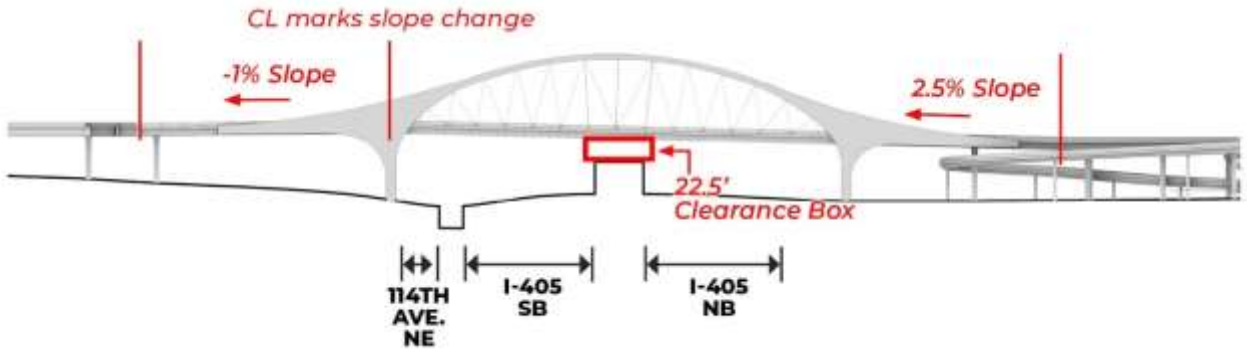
Elevation of the arch I-405 span alternative (looking north).
